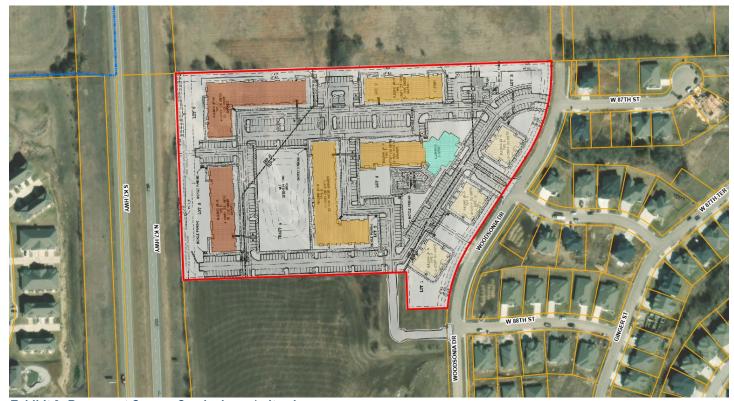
Reserve at Copper Creek phase 1 site plan.
